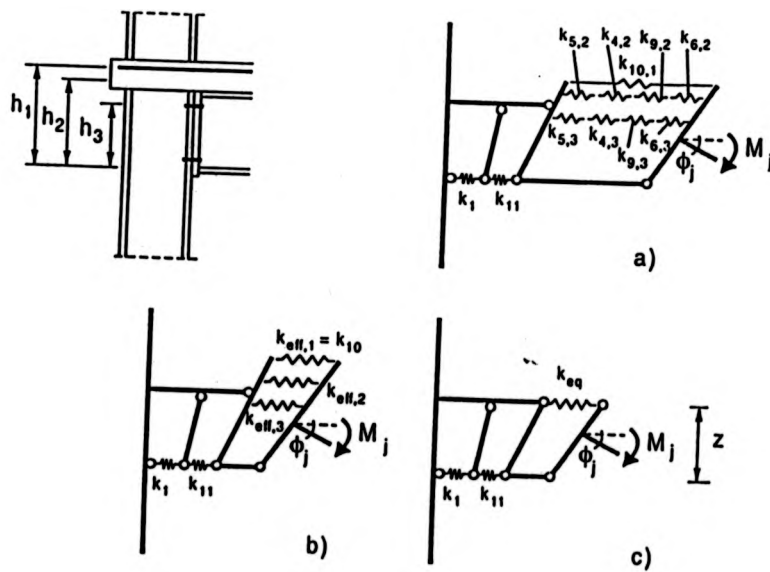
Spring model for a beam-to-column end plated joint with two bolts rows in tension
